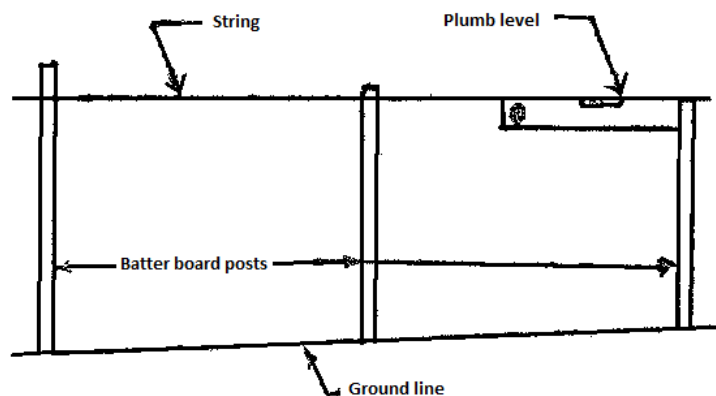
Transferring the height of the foundation from the corner post to all batter board post around the building layout.
